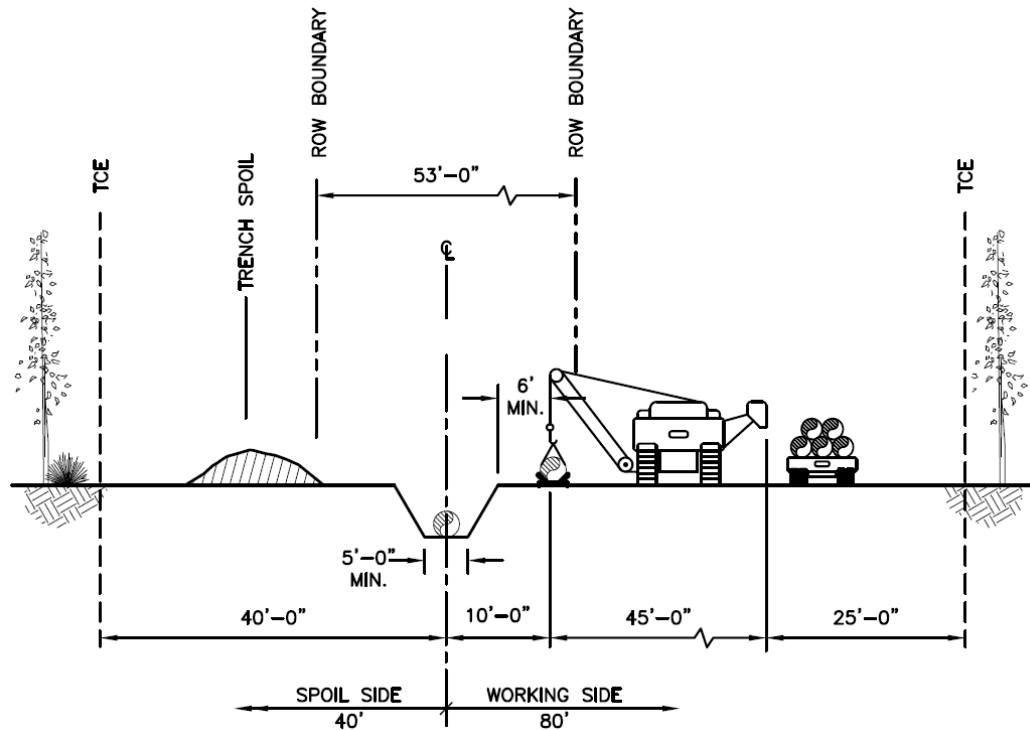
ASAP Typical Right of Way – Tundra Ice Road
